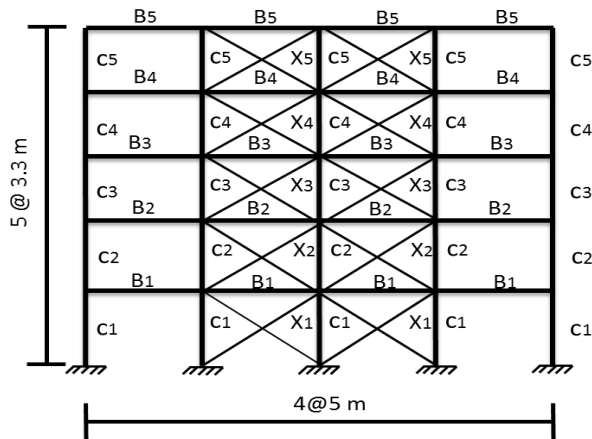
Example 1: 5-story, 4-bay braced frame with grouping details
